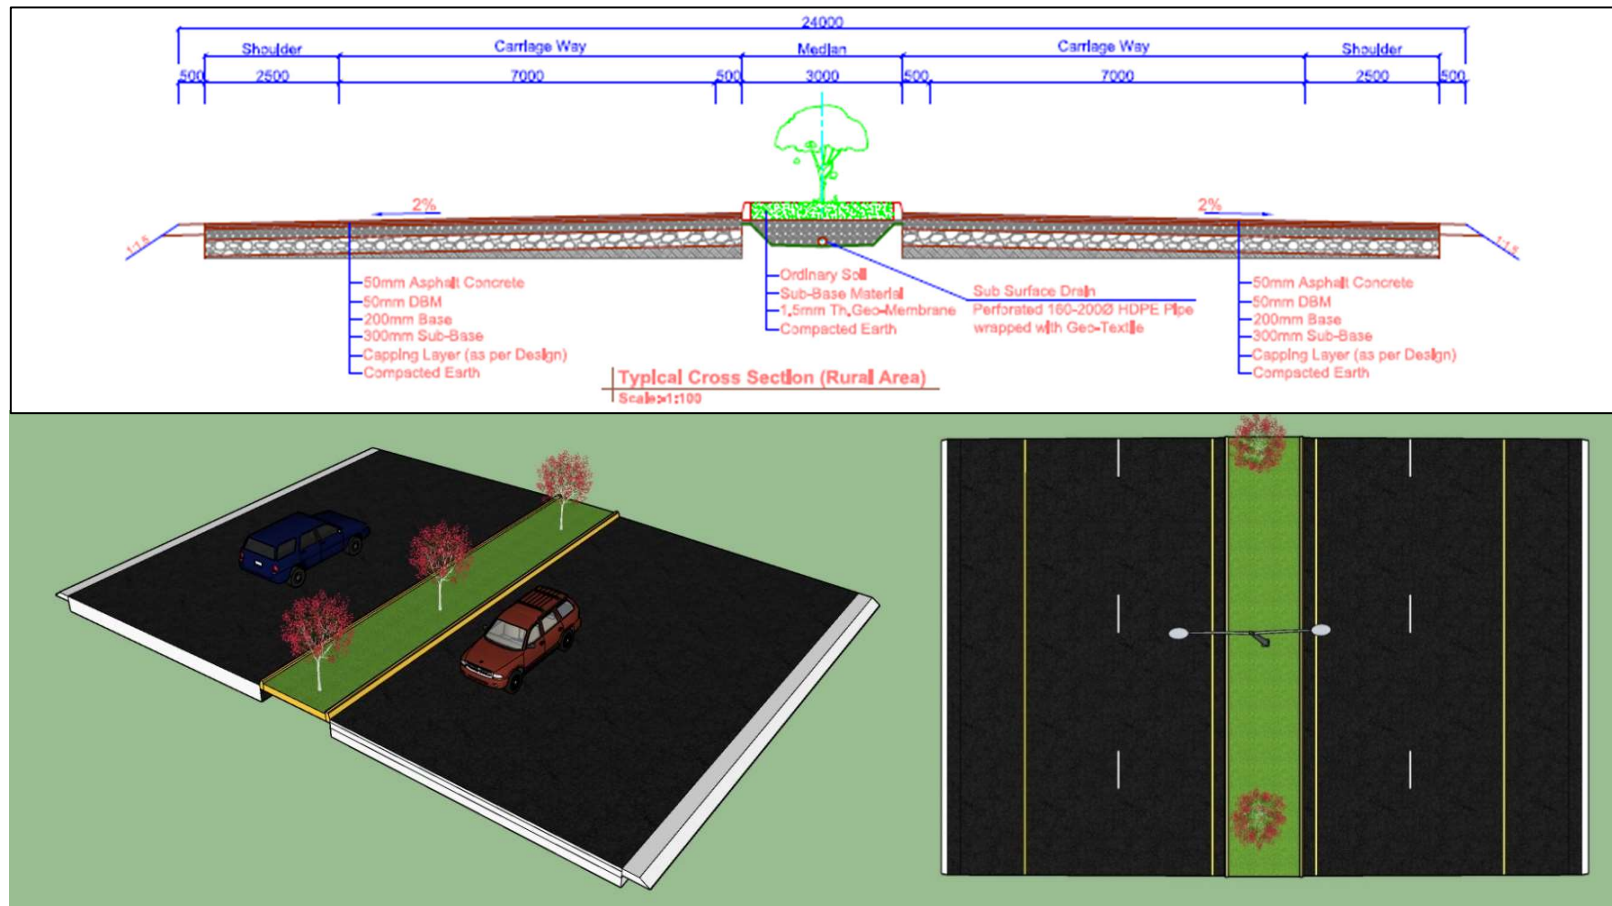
Typical Design of Rural Area (4 Lane Road)
